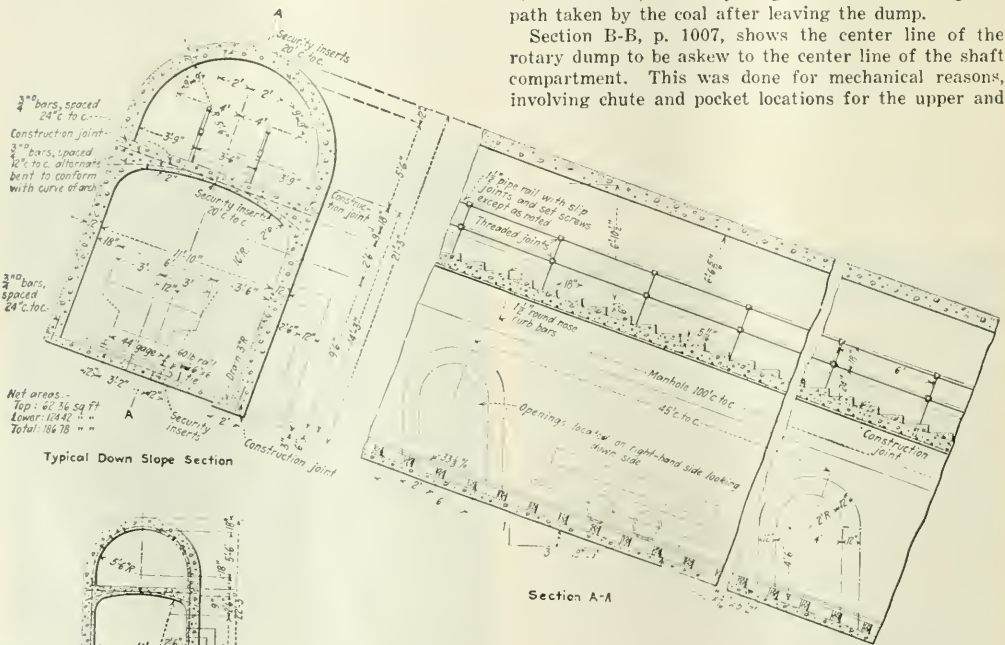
CONSTRUCTION DETAILS OF DOUBLE-DECK SLOPE WHICH SERVES AS HOISTWAY AND MANWAY
